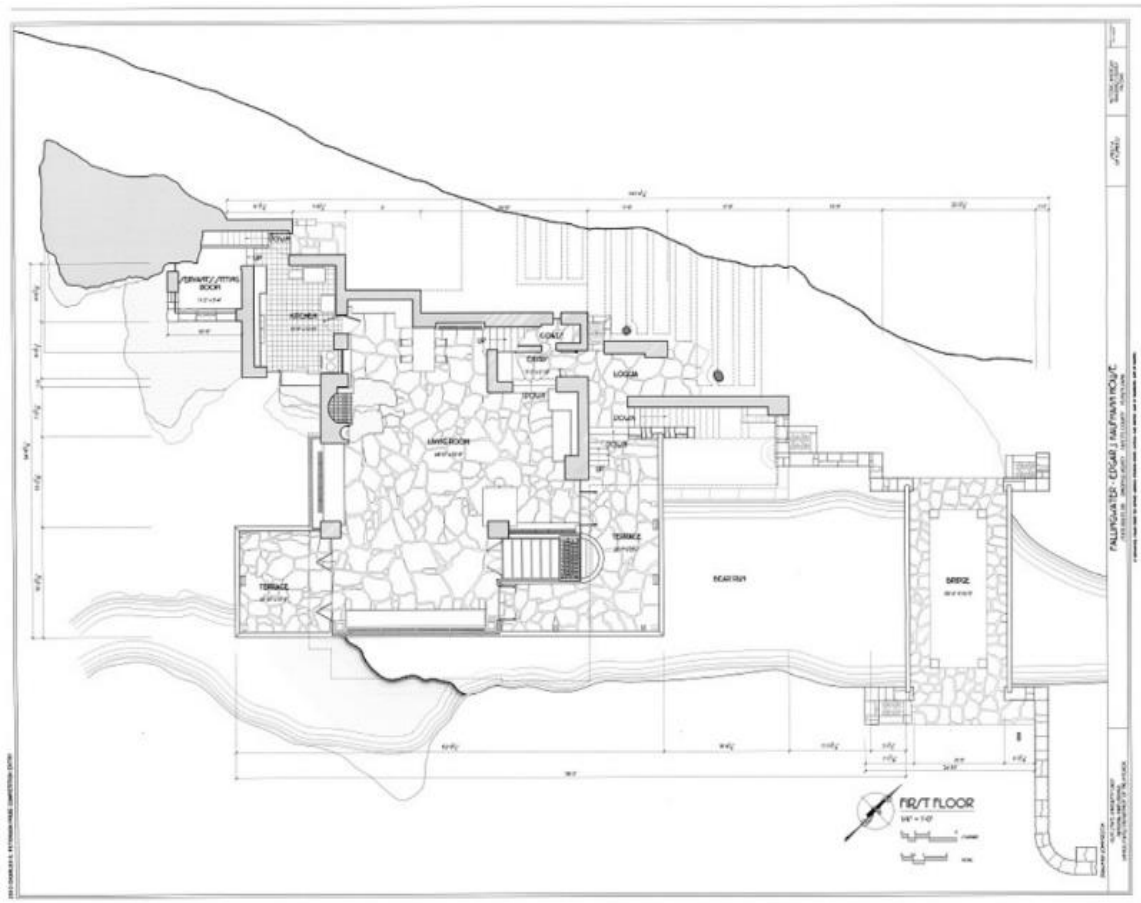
Fallingwater Plan (First Floor Plan – Falling water, State Route 381 (Stewart Township), Ohiopyle, Fayette County, PA, n.d.)
